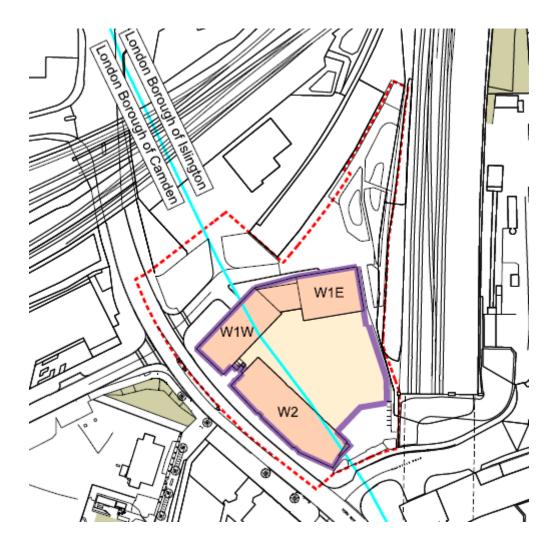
Location plan for proposed building W1 and W2 within the Triangle Site
